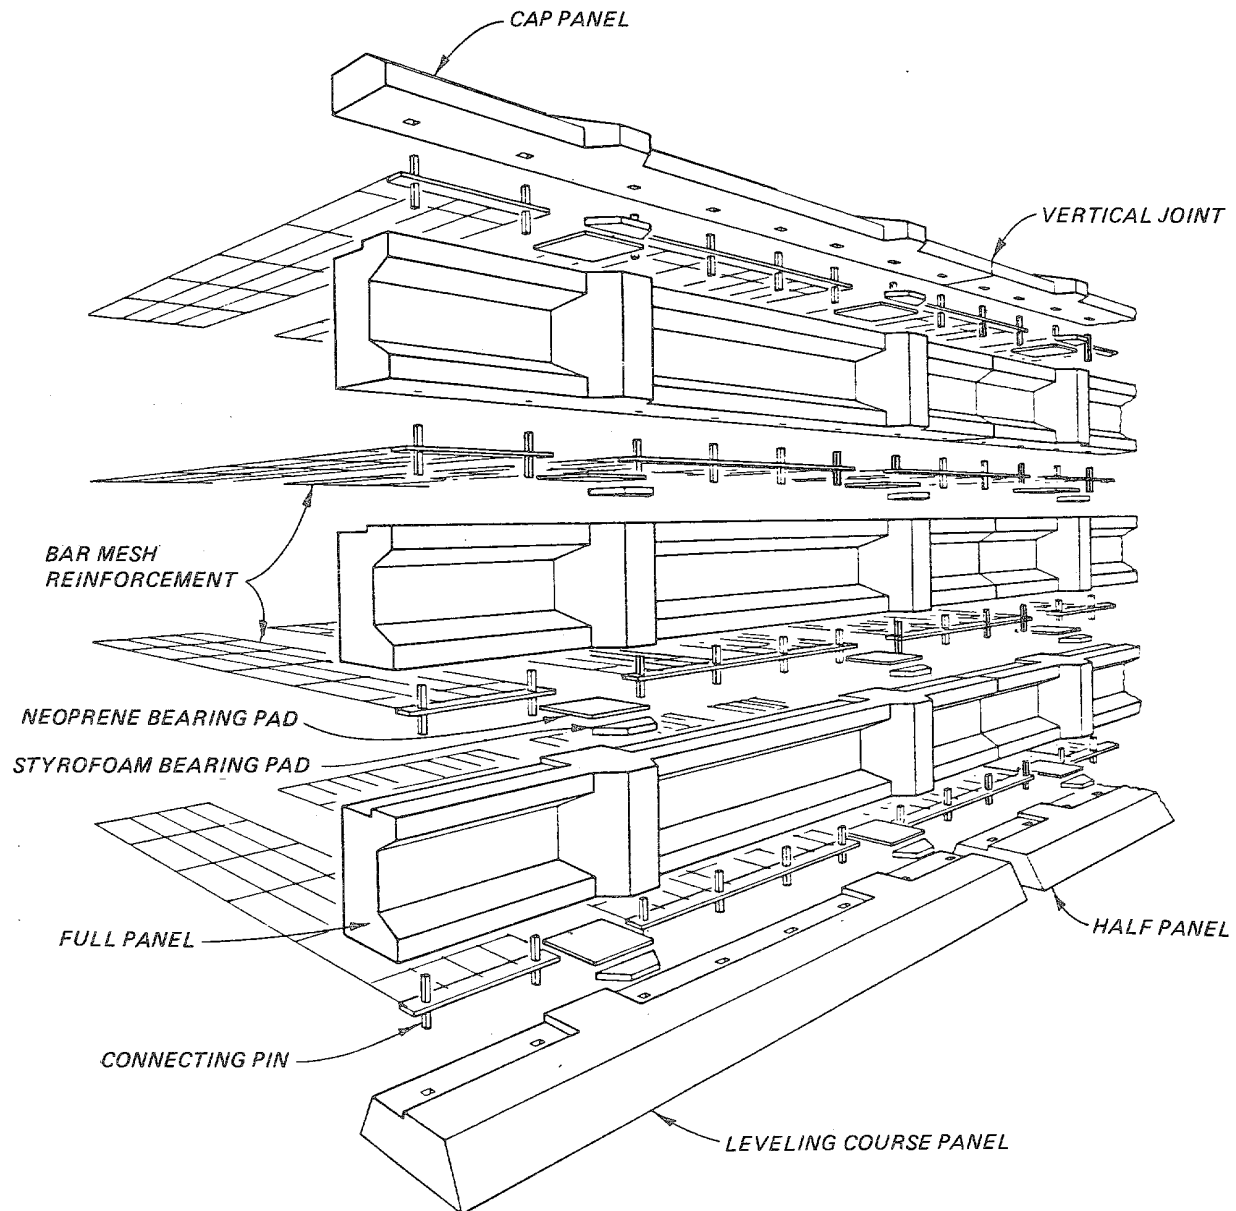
Schematic diagram of reinforced soil embankment retaining wall (after Hilfiker Company)
